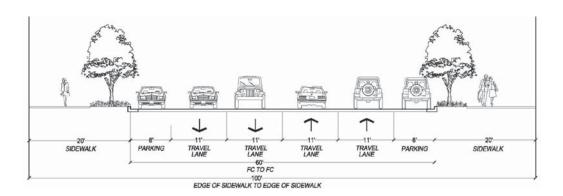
Recommended mid-block cross-section for 20th Street S. looking west between Crystal Drive and S. Clark/Bell Street
